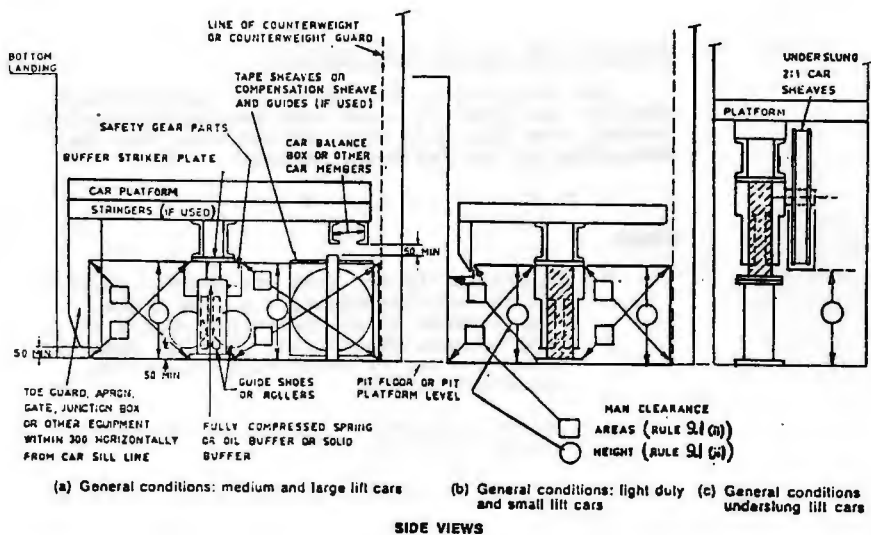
BOTTOM CAR CLEARANCES—TYPES A, B AND C SAFETY GEAR
